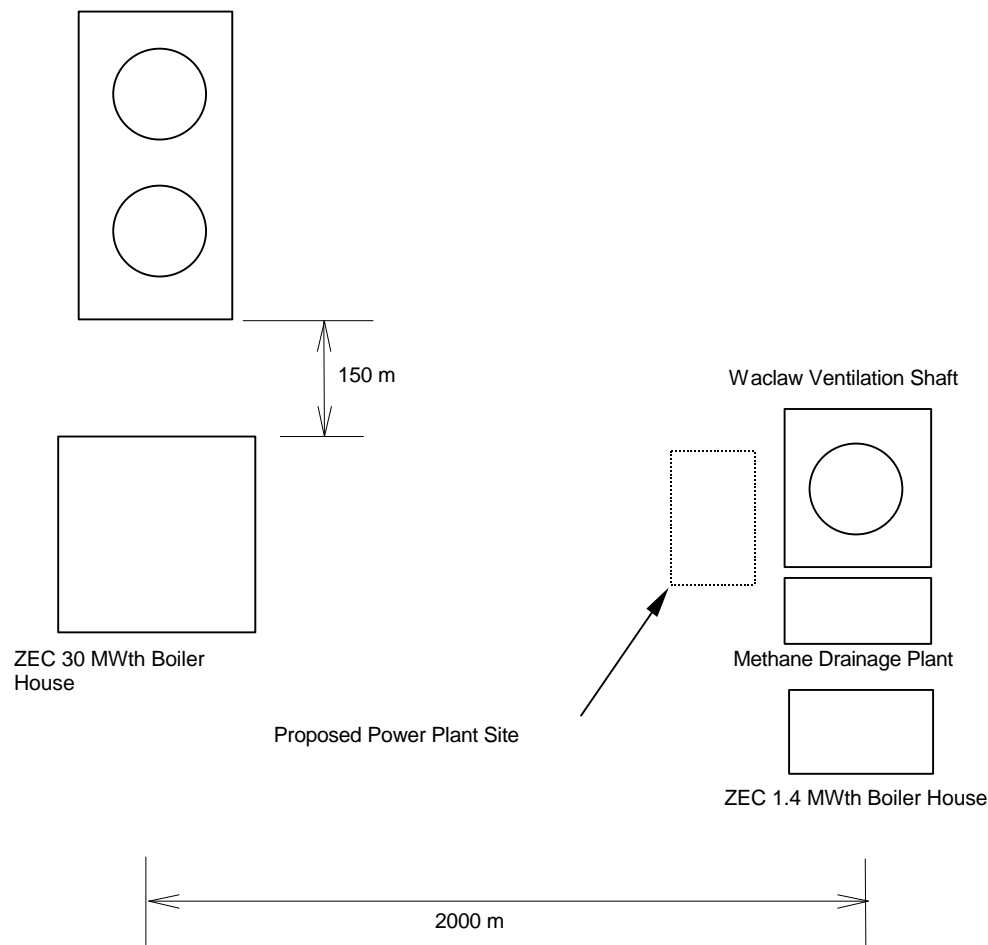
Proposed Site Layout for the Power Plant on Wesola Mine Property
